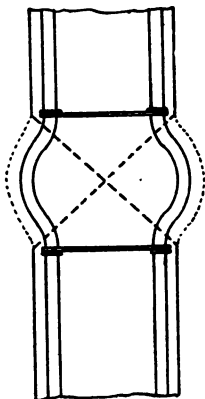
Sketch Showing the Manner in which Columns Fail.
